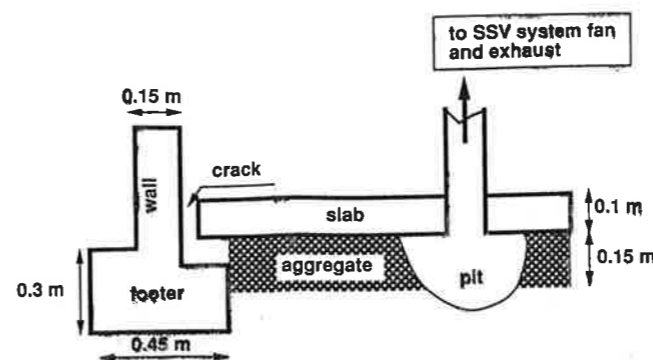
Vertical cross section of a portion of a basement and its surroundings. The crack at the wall/footer/slab joint is shown greatly exaggerated. The dimensions are typical ones. Typical crack width ranges from 0.5 to 3 mm.
